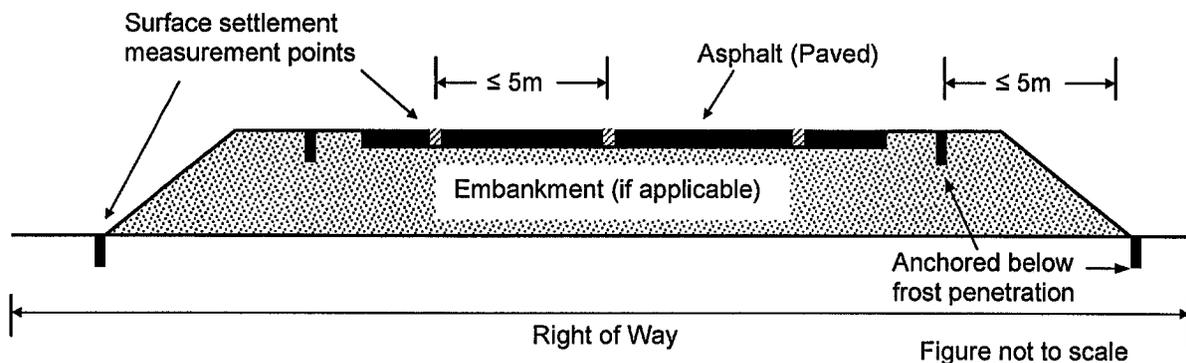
Typical configuration of surface settlement monitoring points along the tunnel alignment.
